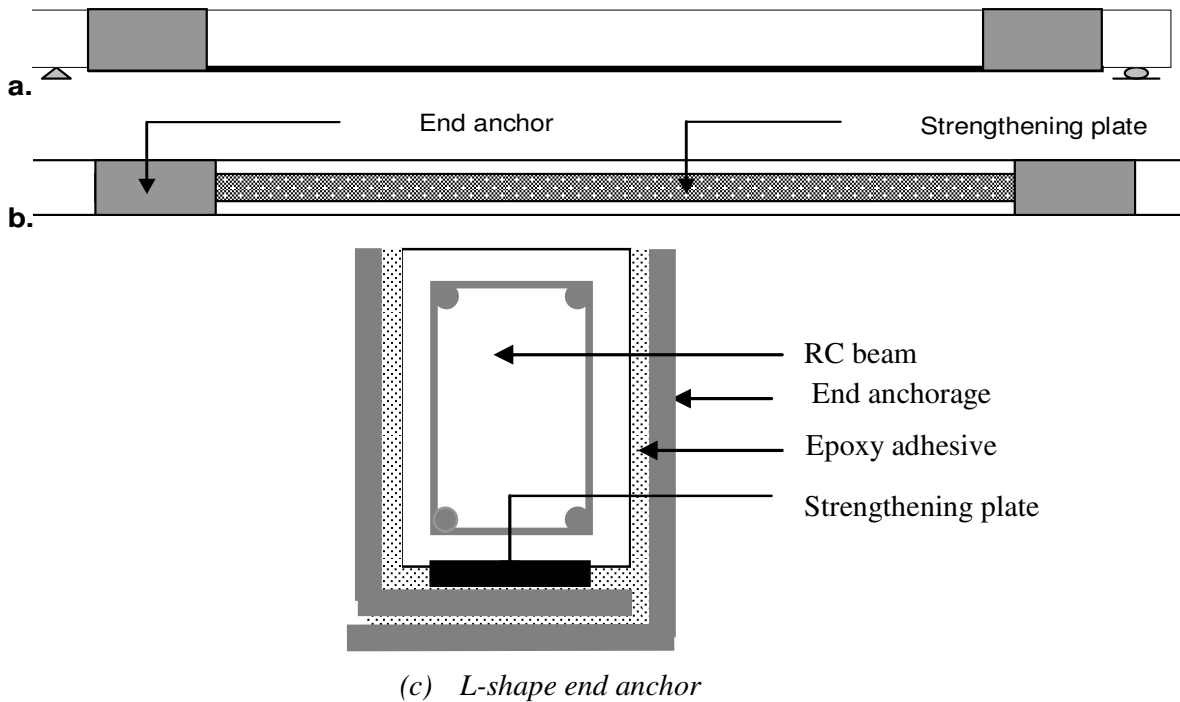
Strengthening and anchoring details. (a) Front view showing the positions of the end anchors. (b) View from the bottom of the r. c. beams showing the end anchors and strengthening plate. (c) L-shape end anchor.
